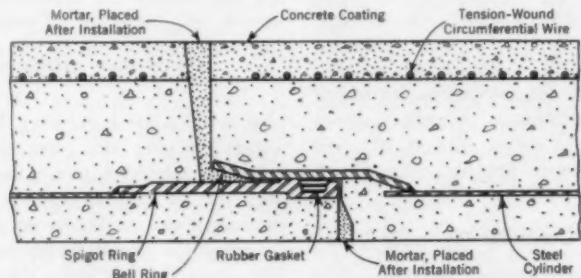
Embedded-Cylinder Prestressed-Concrete Pipe and Joint
